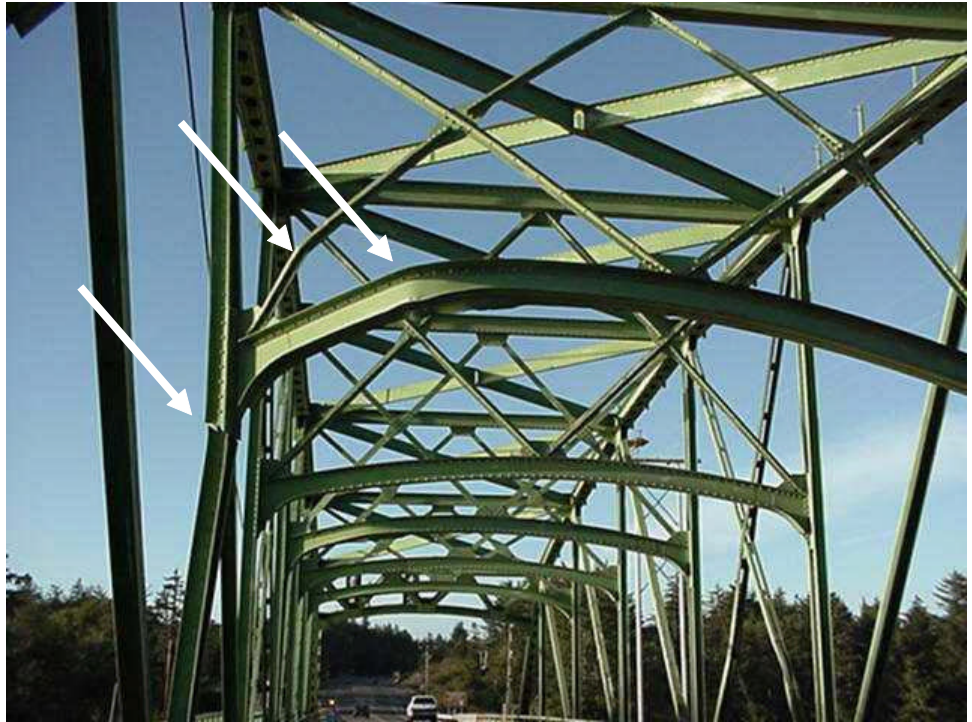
Collision Damage to Truss Members Due to Overheight Vehicle
